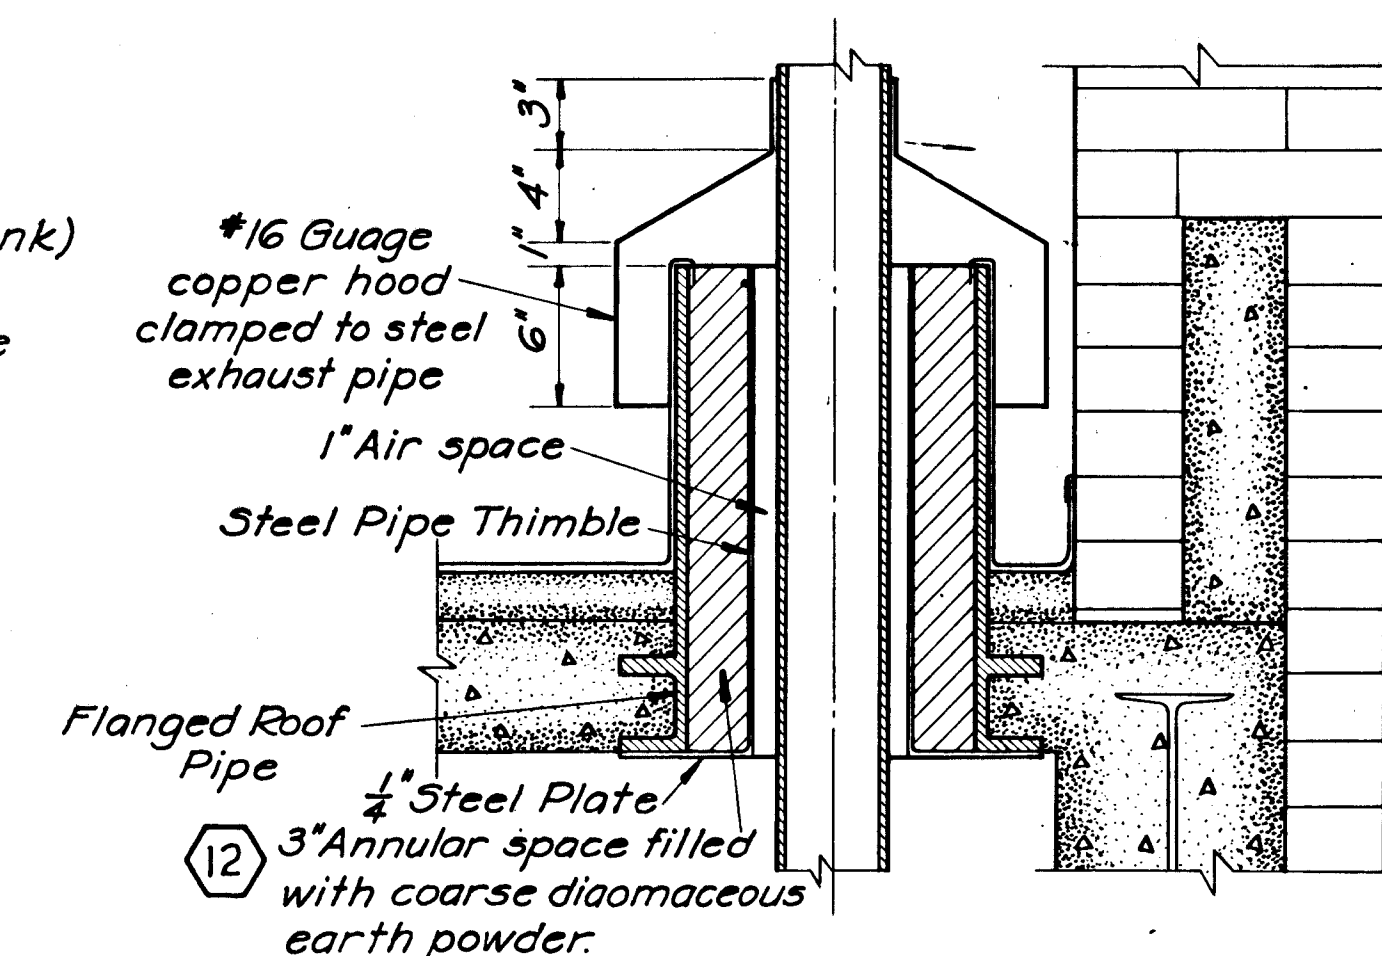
DETAIL OF GASOLINE ELECTRIC GENERATOR SET EXHAUST ASSEMBLY
